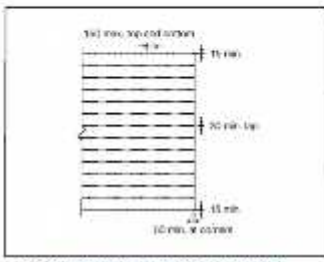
WALLING SPACING DETAIL FOR INFILL PANELS ON VERGE (HORIZONTAL)
